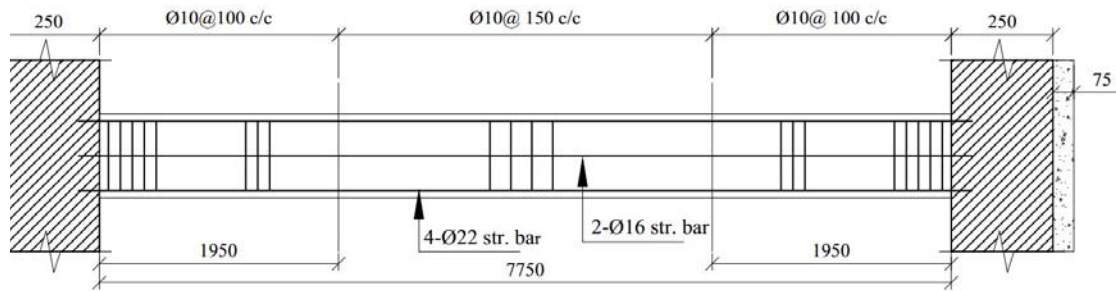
Longitudinal section of retrofitted beam of 2nd floor
